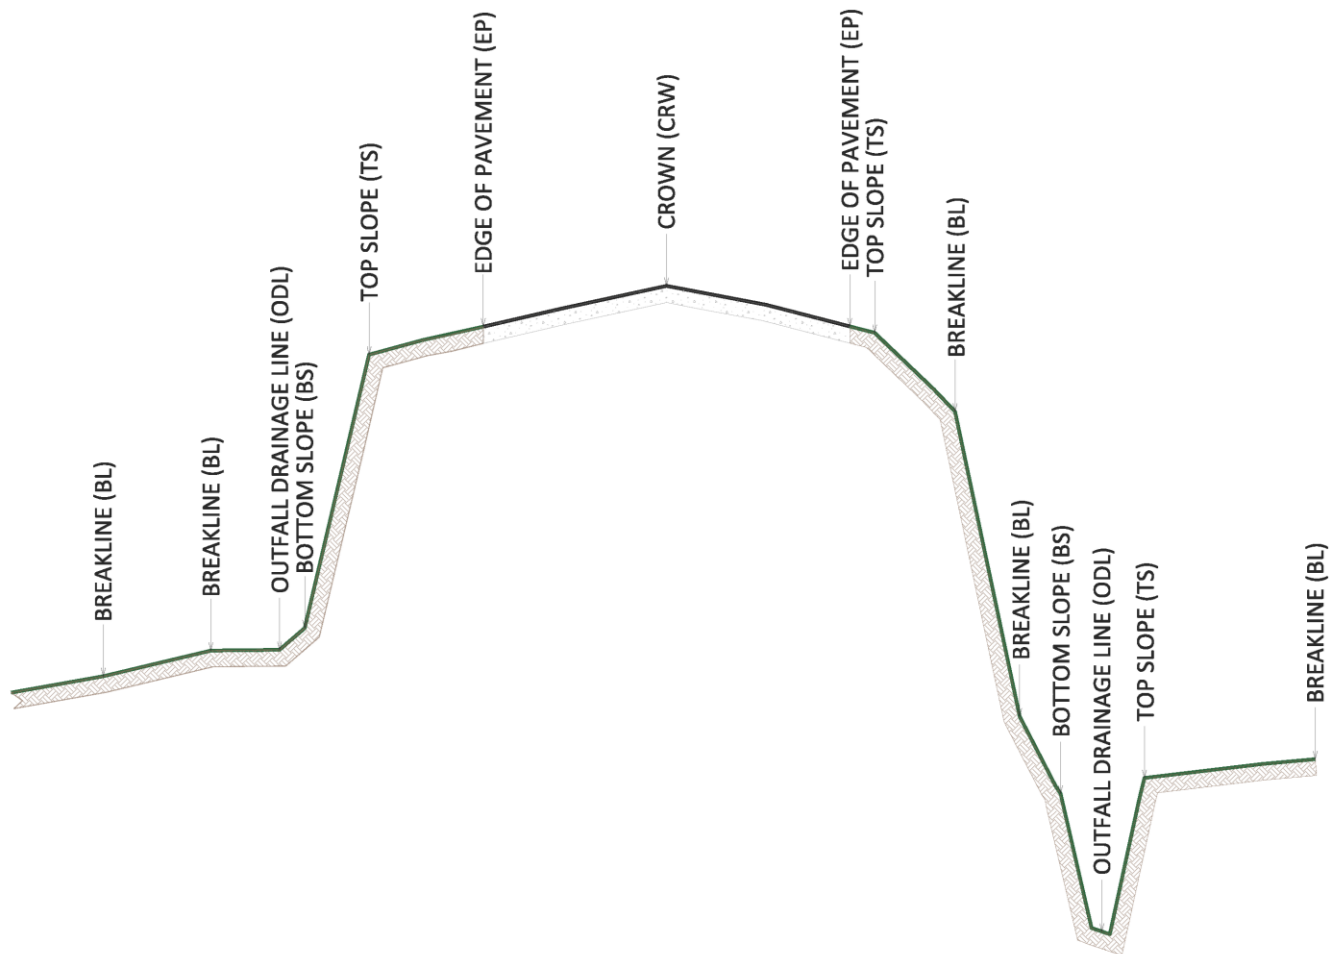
ROADWAY SURVEY DETAIL – CROSS SECTION
